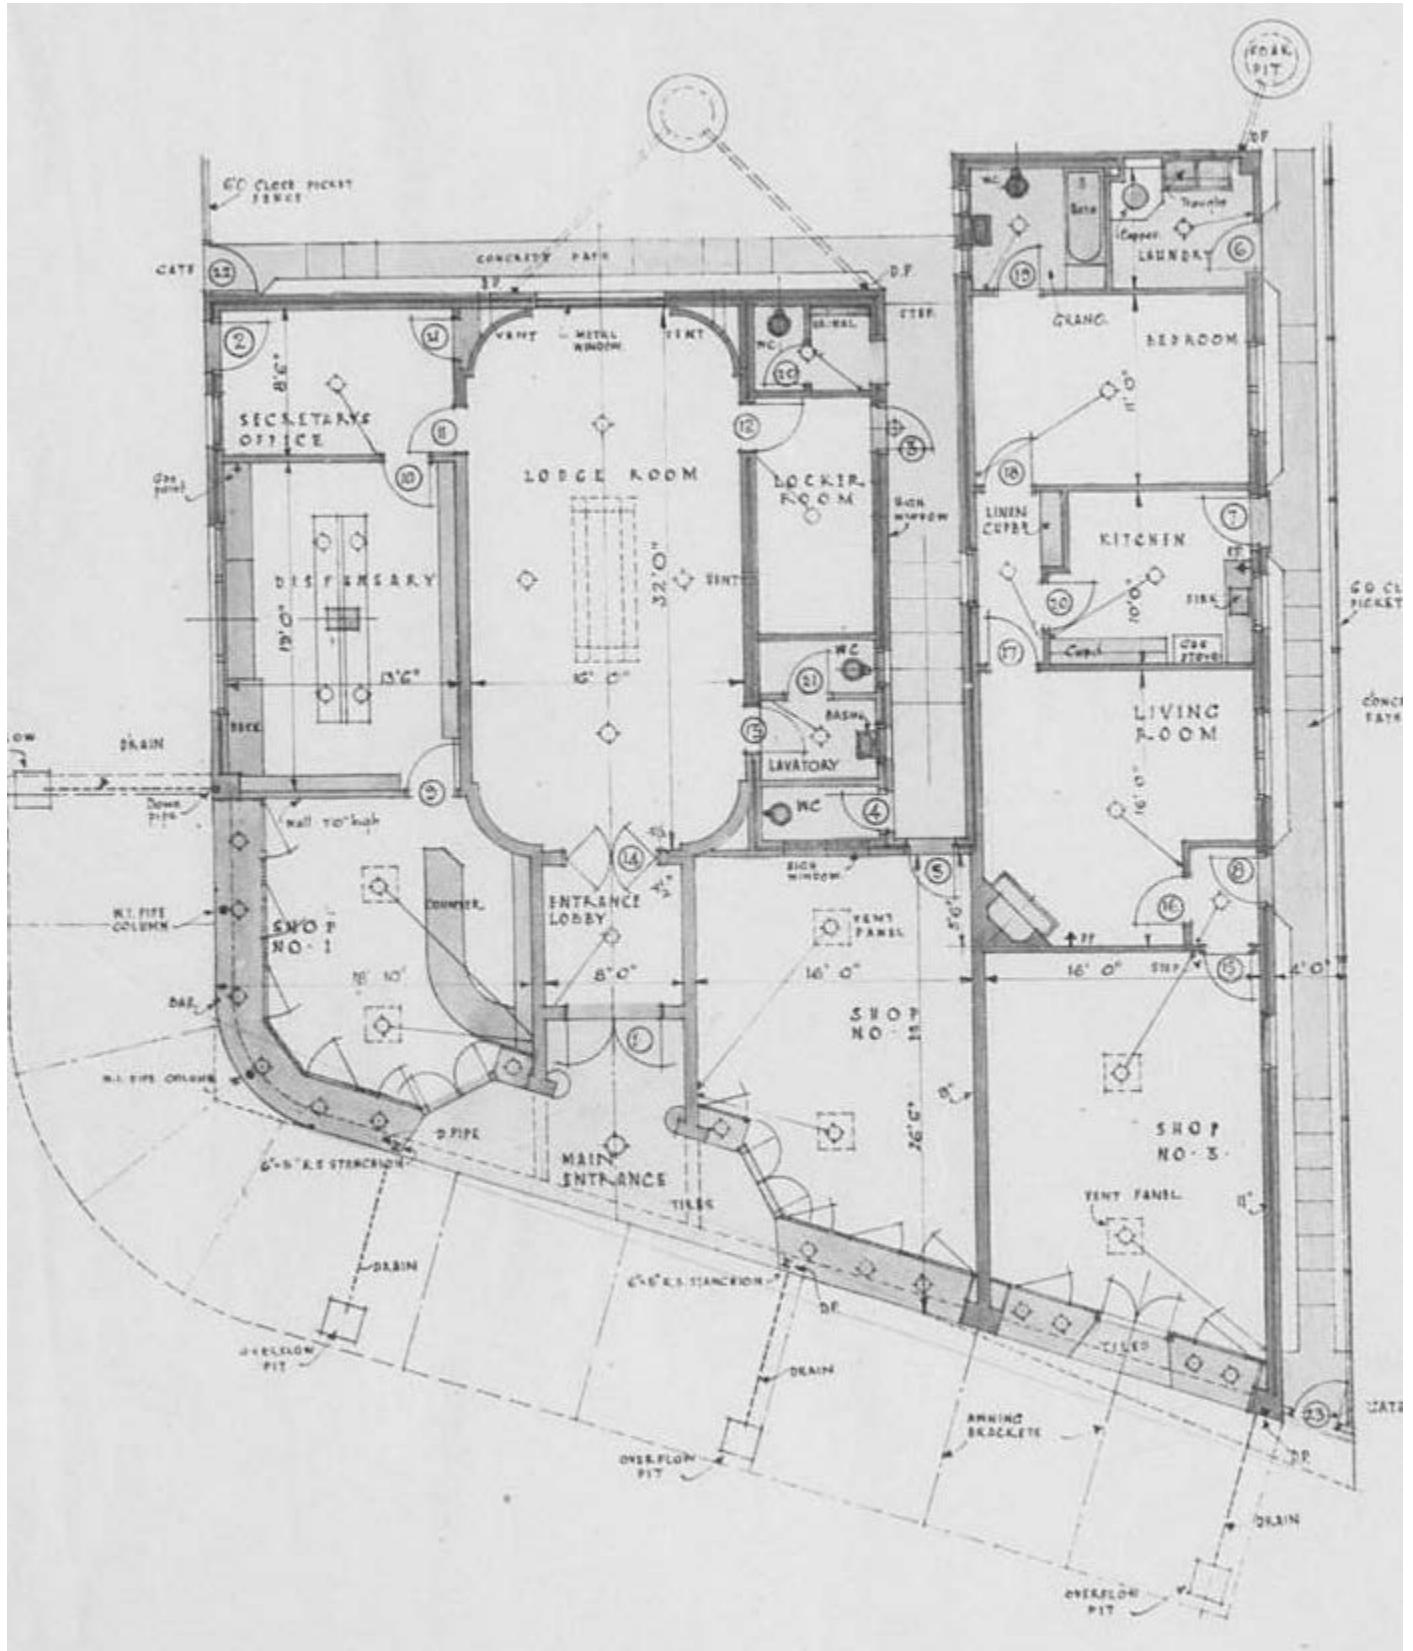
Original Plans for 553 Albany Highway, Victoria Park - Friendly Societies Building – Floor Plan
